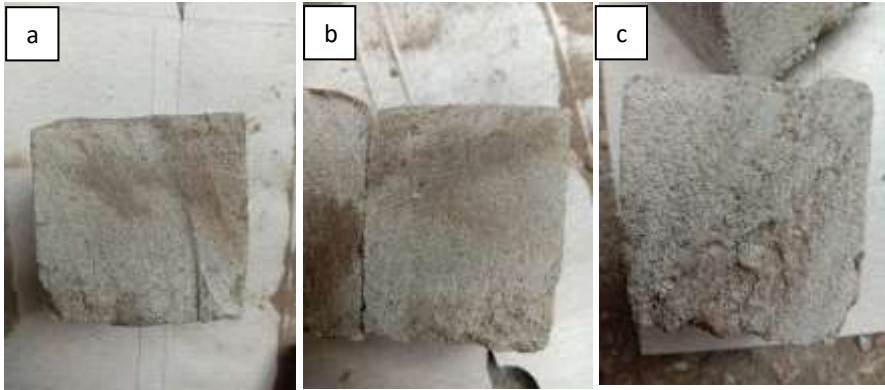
General view and structural macrotecture of soil-cement specimens (100x100x100 mm): a – clay-cement specimen; b – loam-cement specimen; c – sandy loam-cement specimen
